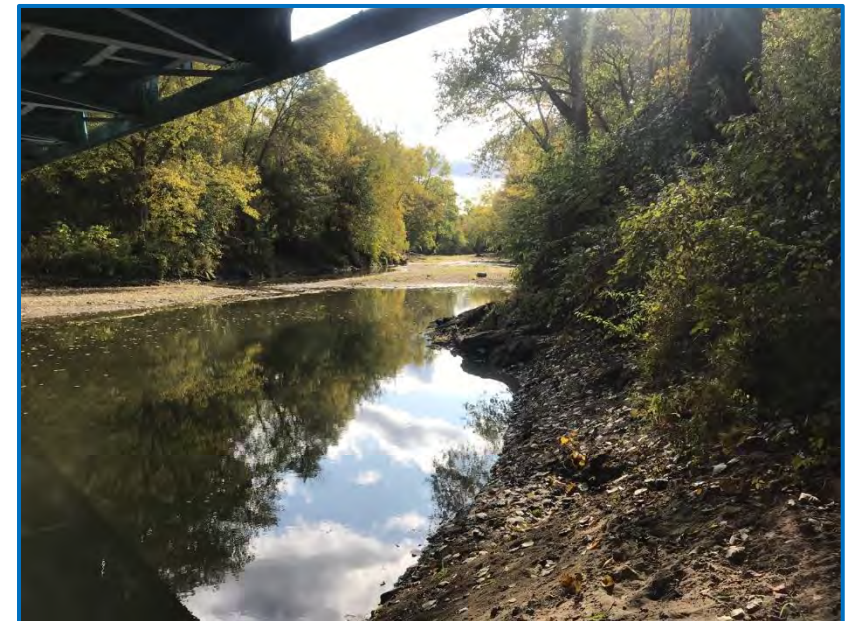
View downstream of Brouilletts Creek facing east (10/22/2019).
